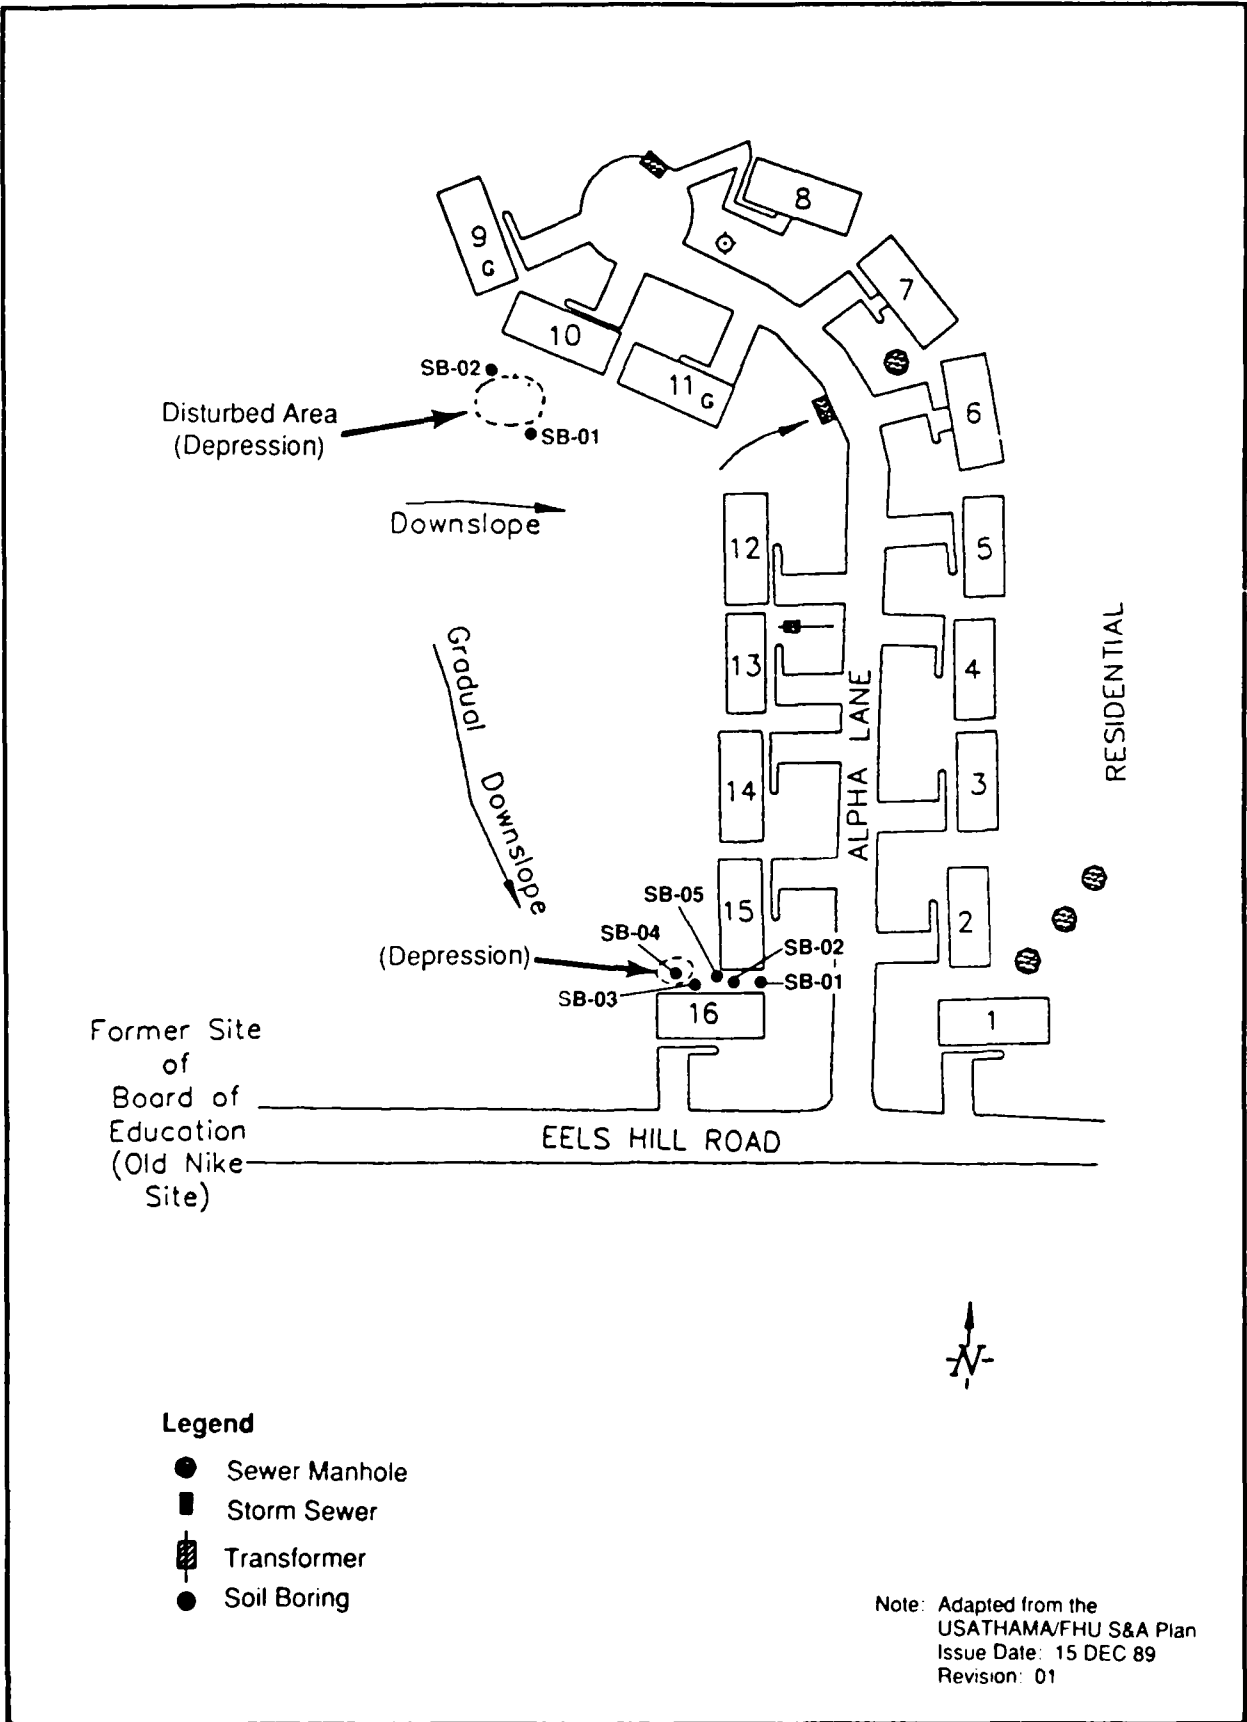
SITE PLAN OF FAMILY HOUSING, MILFORD, CT
